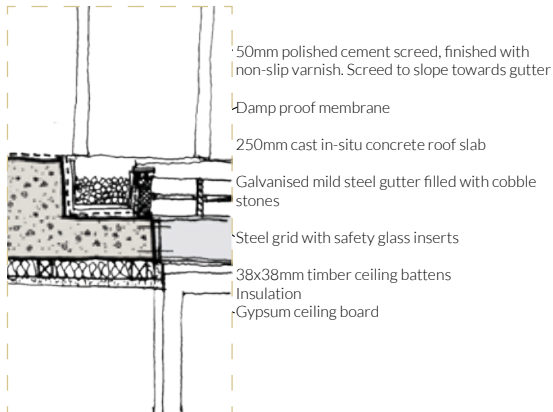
Light shaft in steel grid in floor allowing light into office spaces
